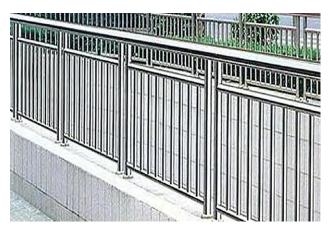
Typical fencing, safety handrails and safety screen examples
